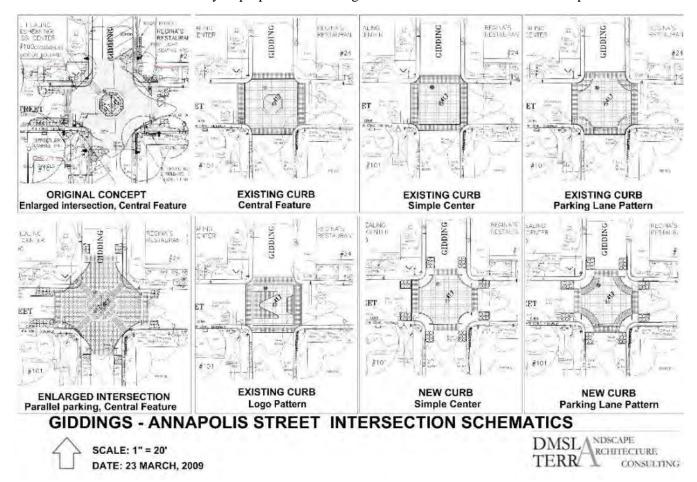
Annapolis Street Streetscape Plan Designs for the Annapolis/Giddings Intersection
